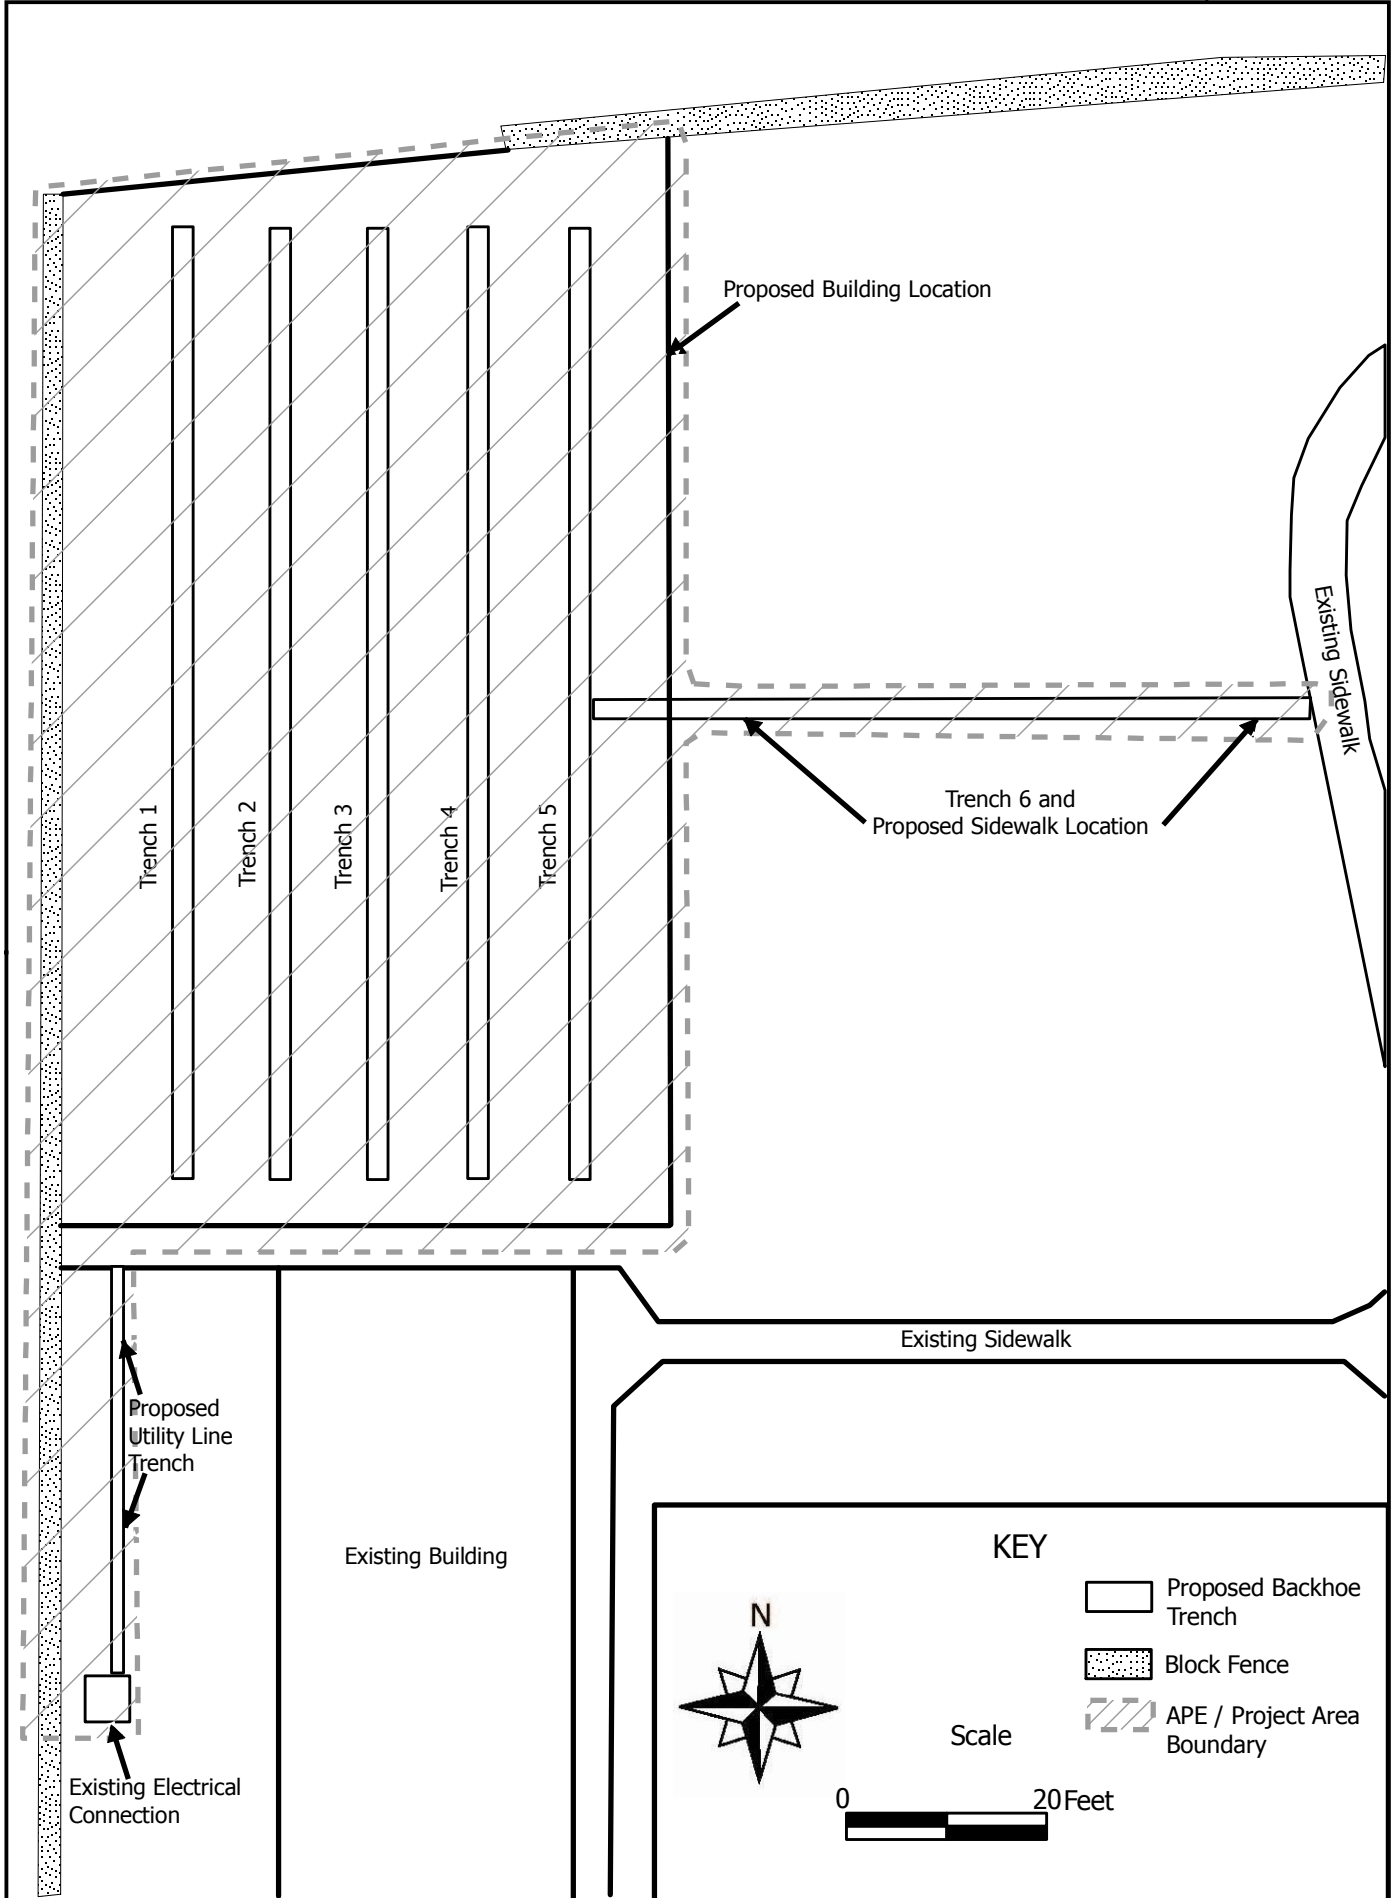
Example figure showing an APE / project area, existing and proposed buildings, sidewalks, utilities, and proposed backhoe trenches.
